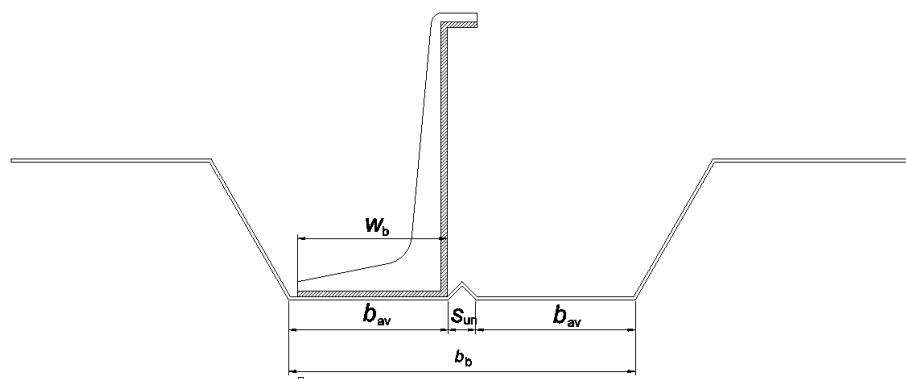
Transverse sheeting with one rib stiffener and parallel connectors.
